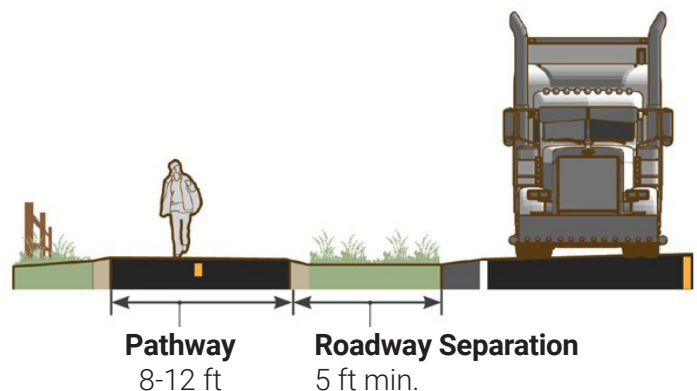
Typical sidepath section (Source: FHWA Small Town and Rural Multimodal Networks Guide)
